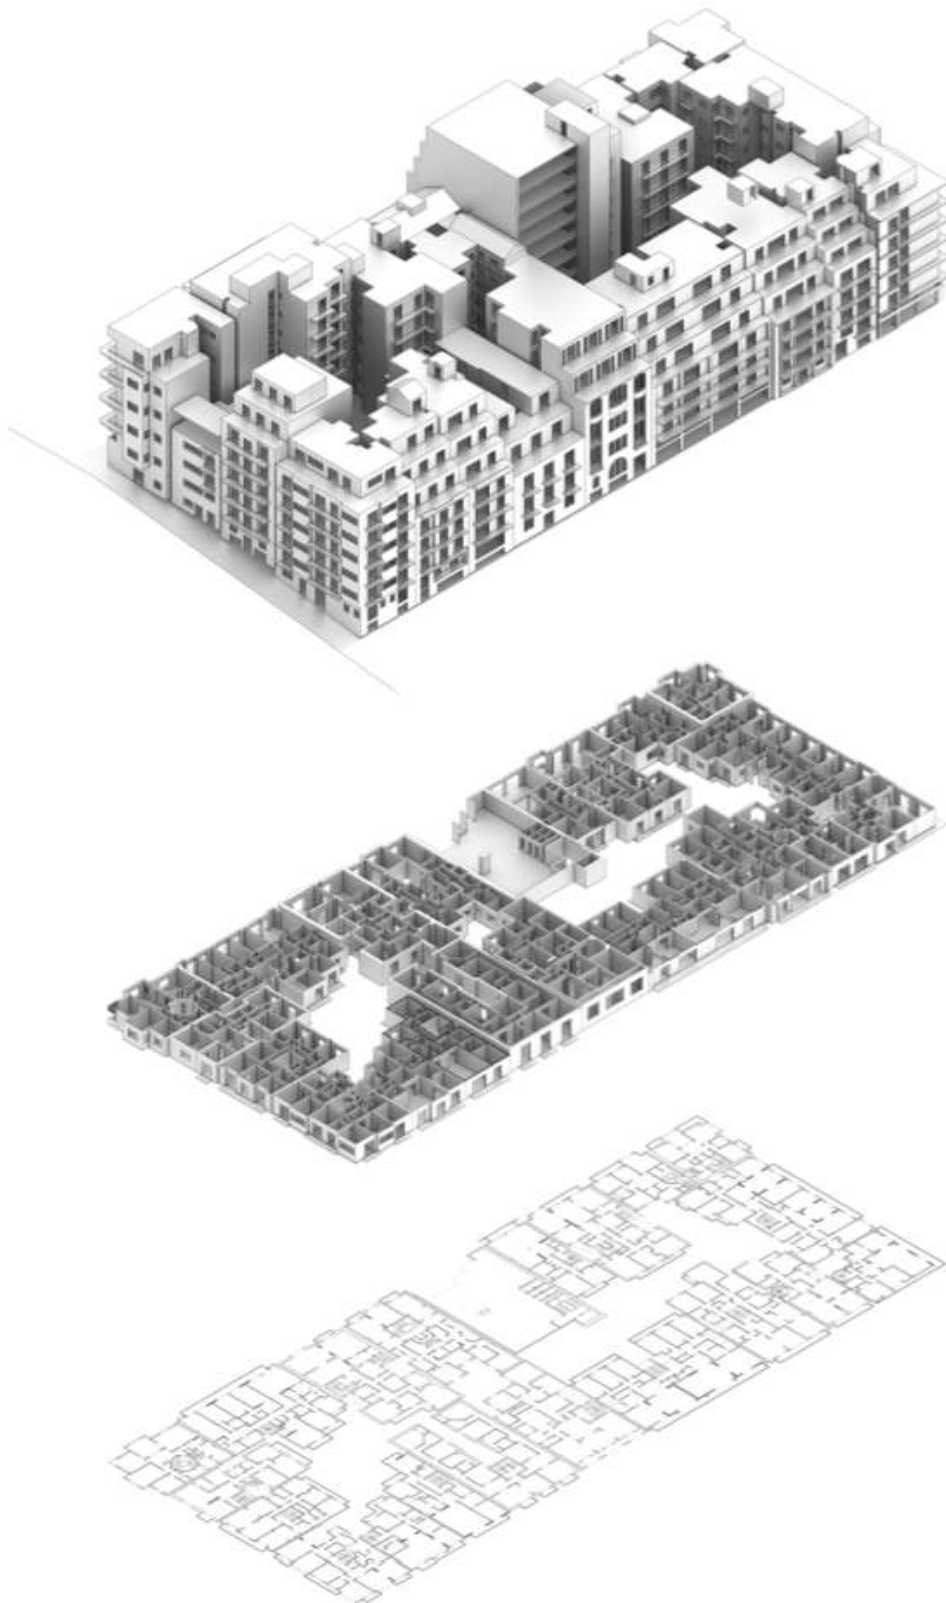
Typical Building Block. Exploded axonometric showing building volume, un-built space, lightwells, typical floor, staircases
